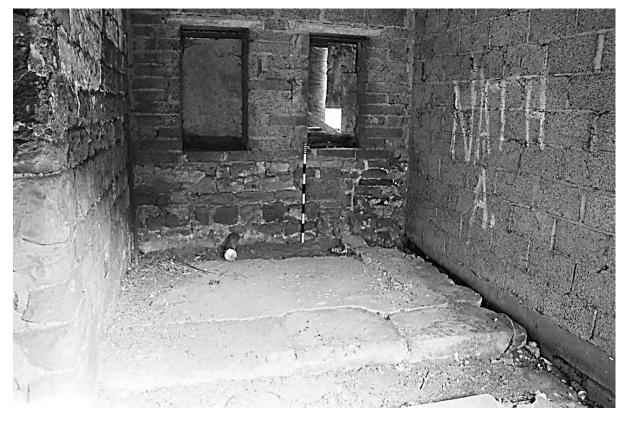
Farm Building 1 South: Room 1.5 Stall Removed (Film 1/32). Facing East.
